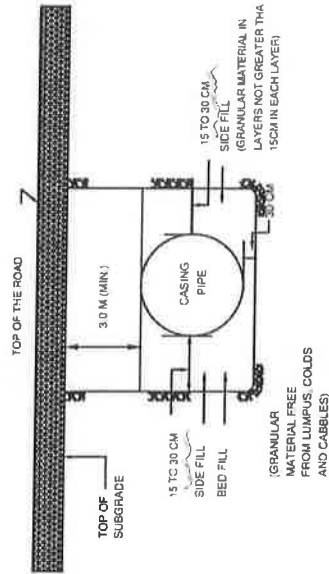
INSTALLATION OF CASING PIPE FOR CROSSING THE ROAD
